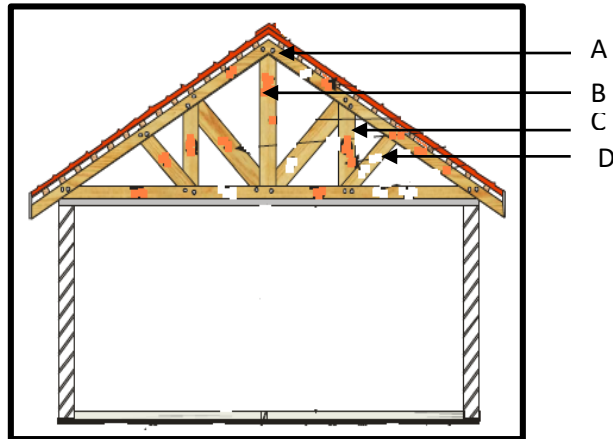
PITCHED ROOF CROSSSECTIONAL AREA
